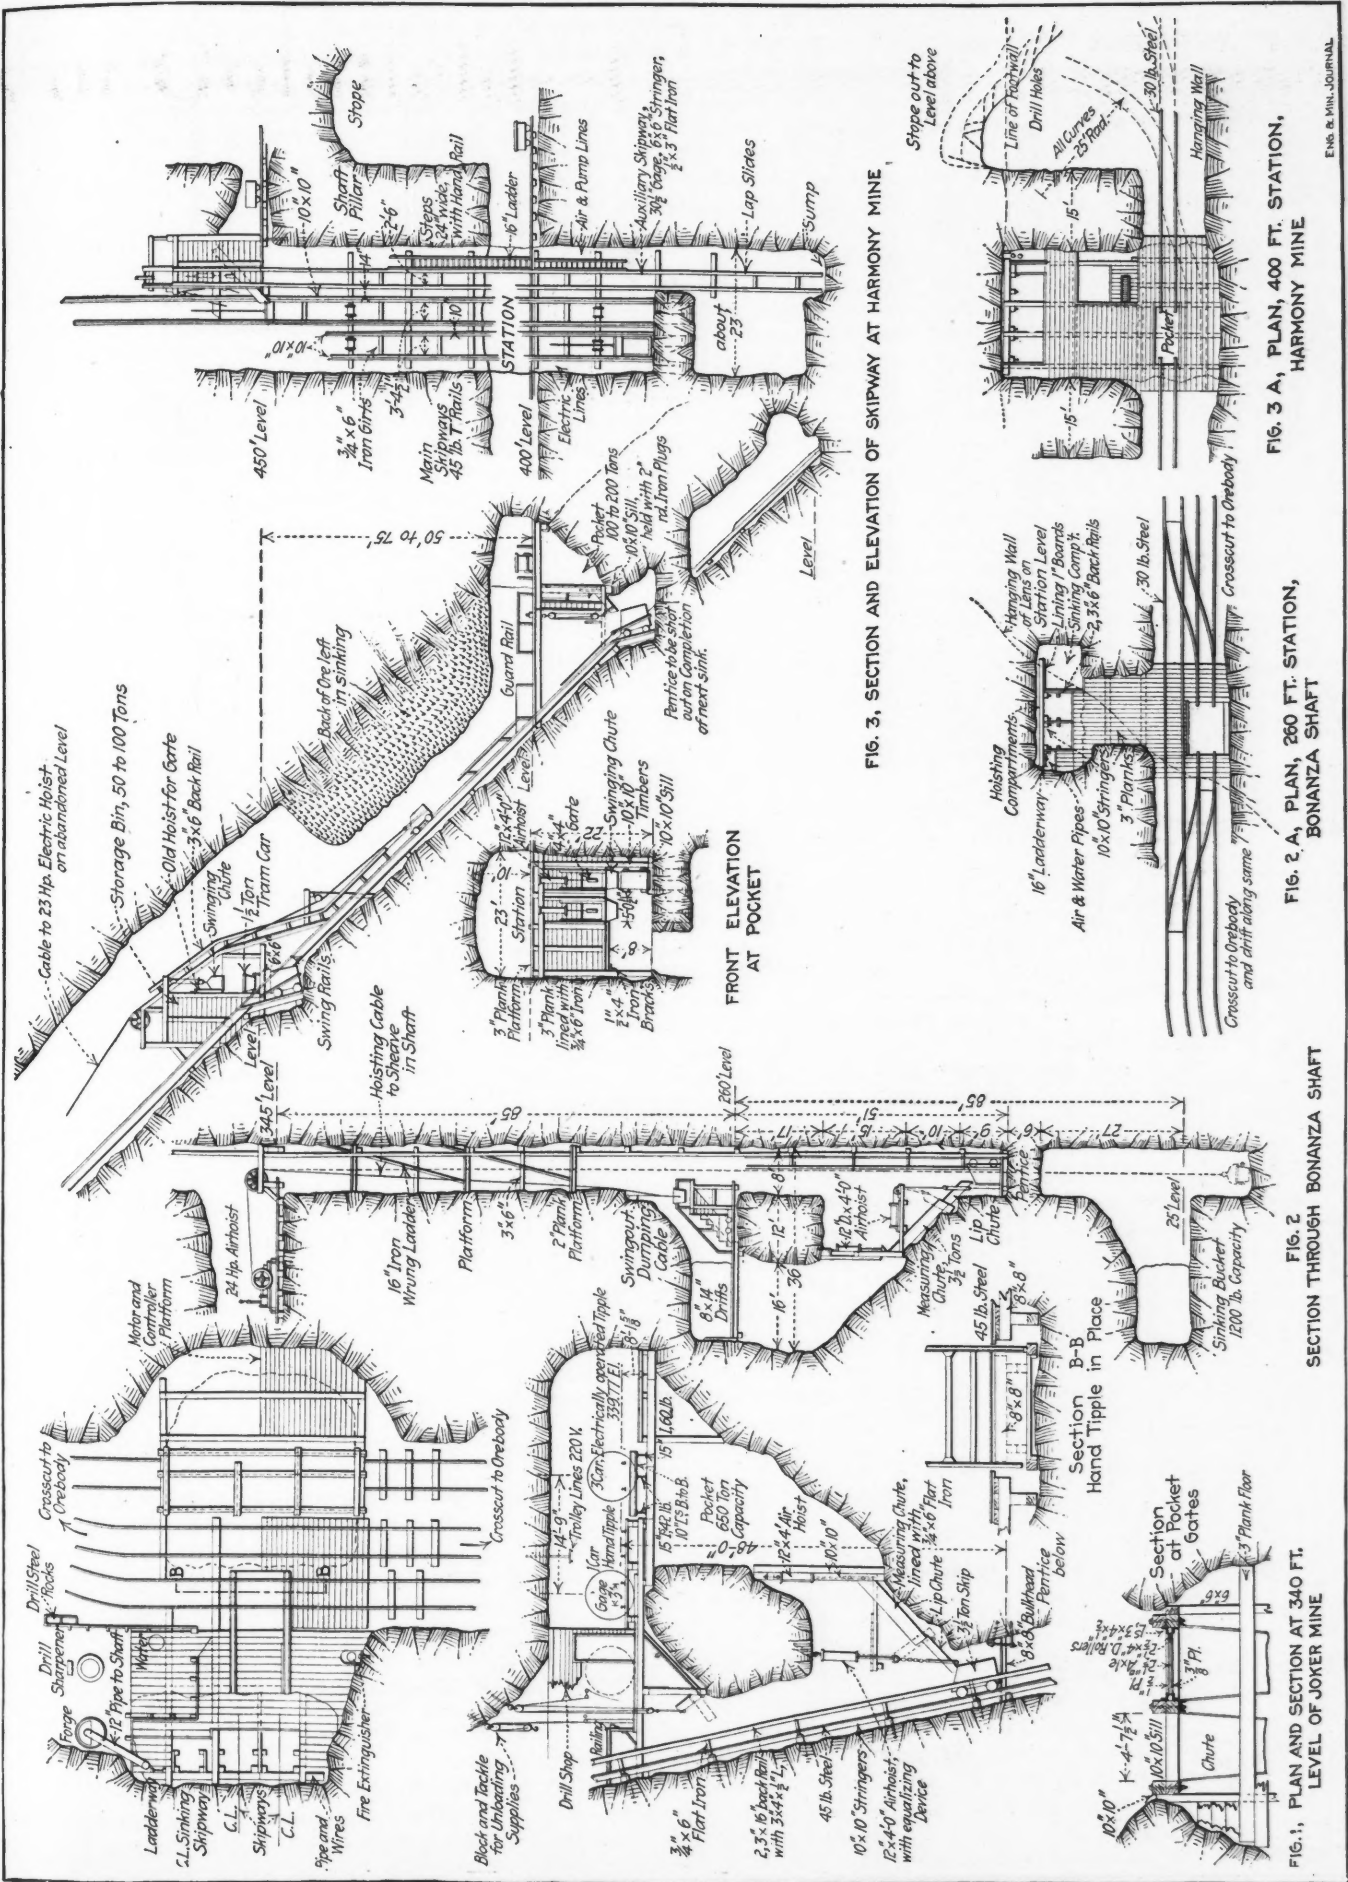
PLAN AND SECTION AT 340 FT. LEVEL OF JOKER MINE
